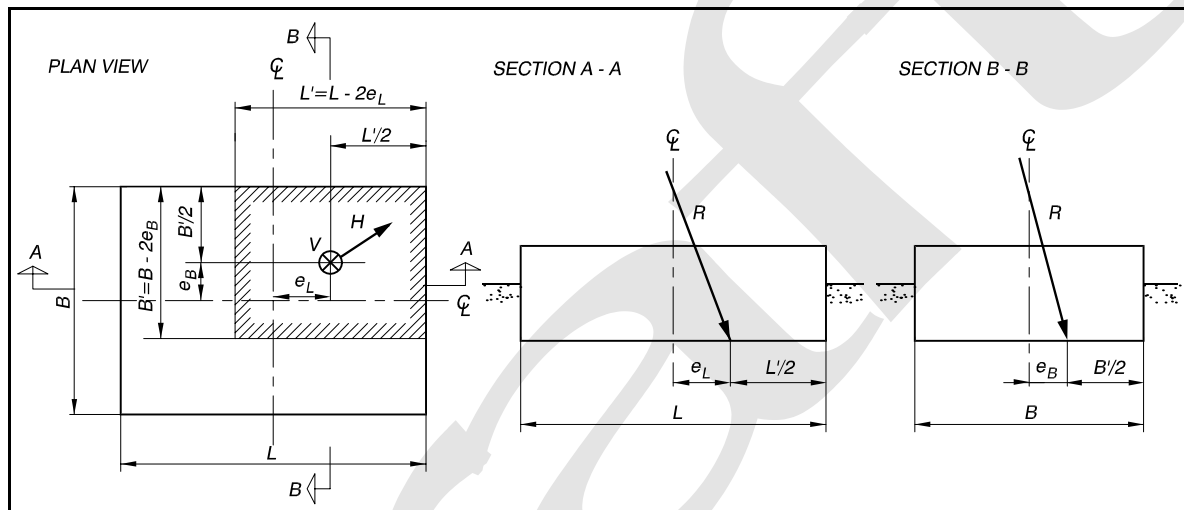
Illustration of fictitious footing to replace real footing under eccentric loading conditions
